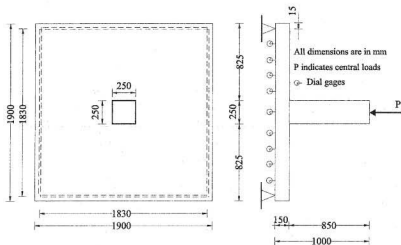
Layout of specimens with one column stub and loaded centrally
